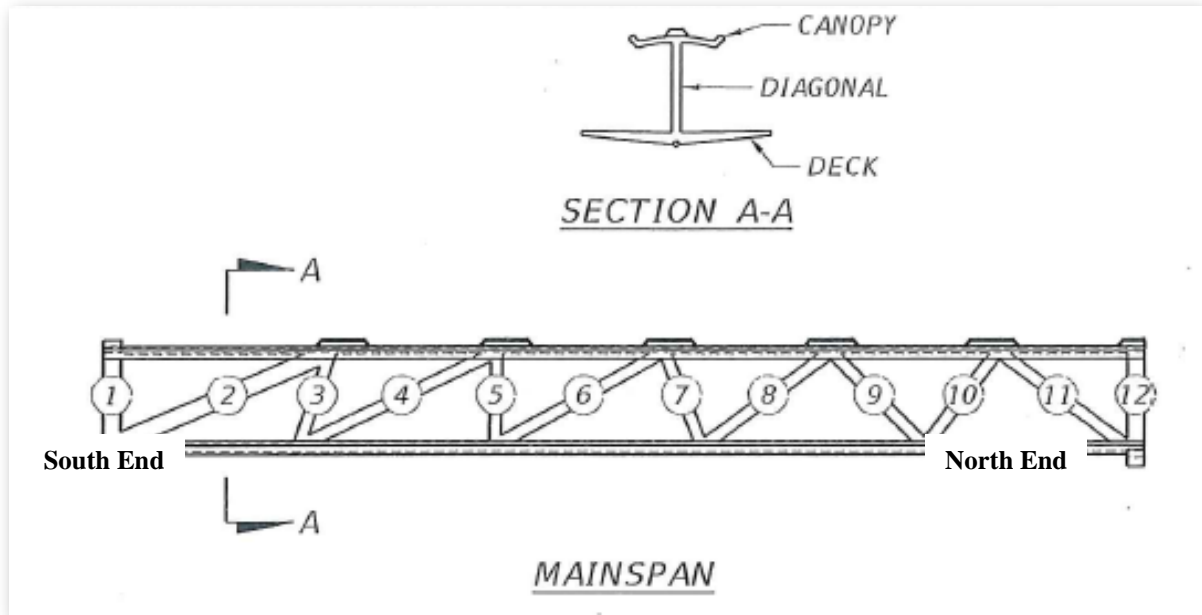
Numbering of Truss Members from 1 (south end) to 12 (north end).
